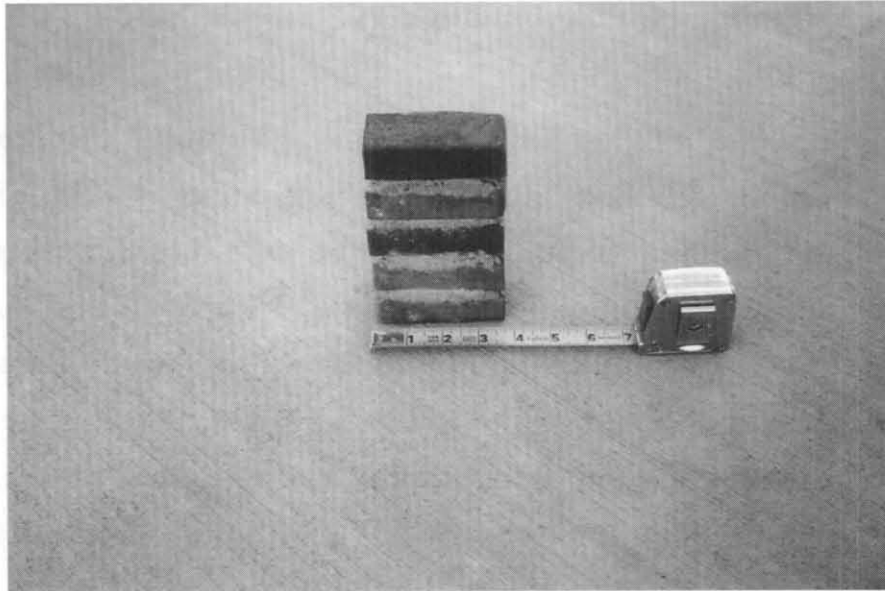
Typical Prism Constructed from Reduced-scale Bricks
